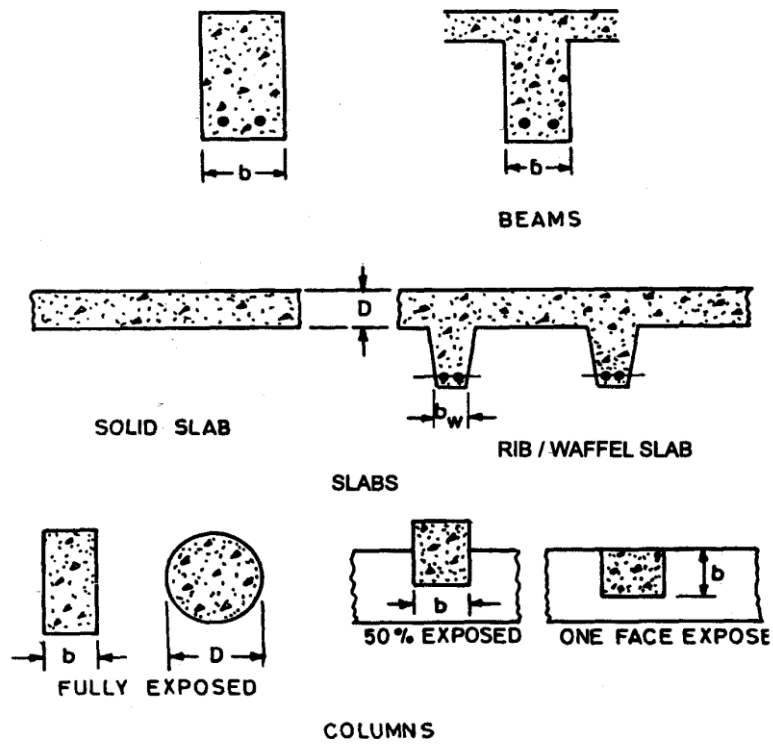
Minimum dimensions of reinforced concrete members for fire resistances
